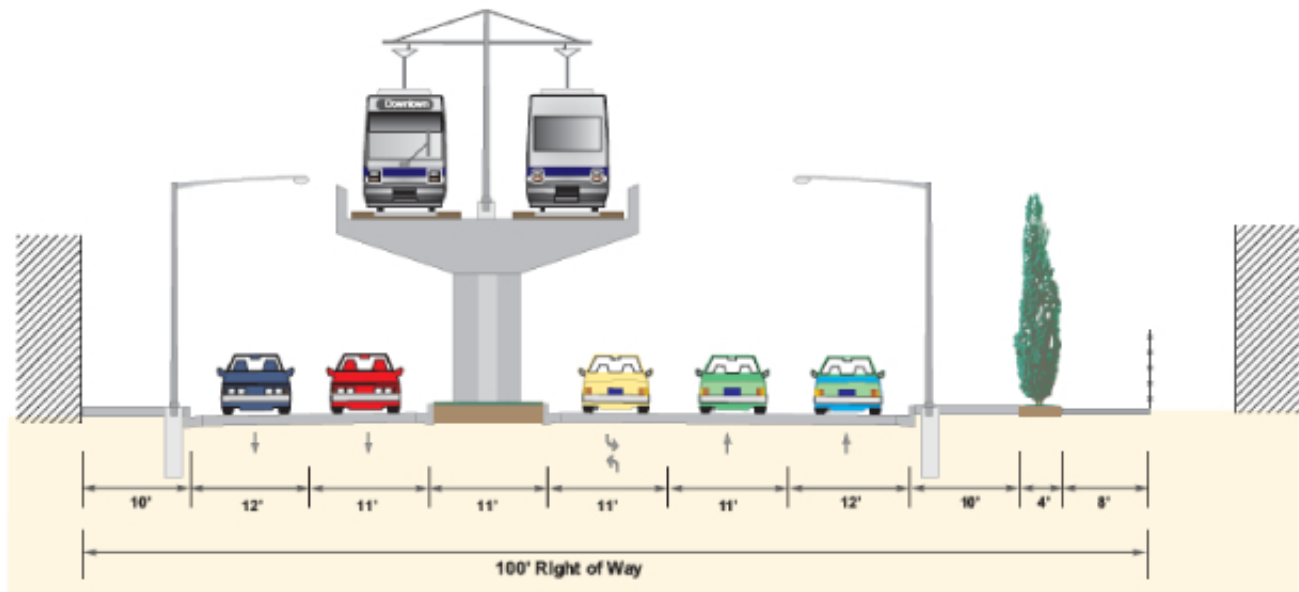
Typical Section – Whittier Blvd. east of Philadelphia
